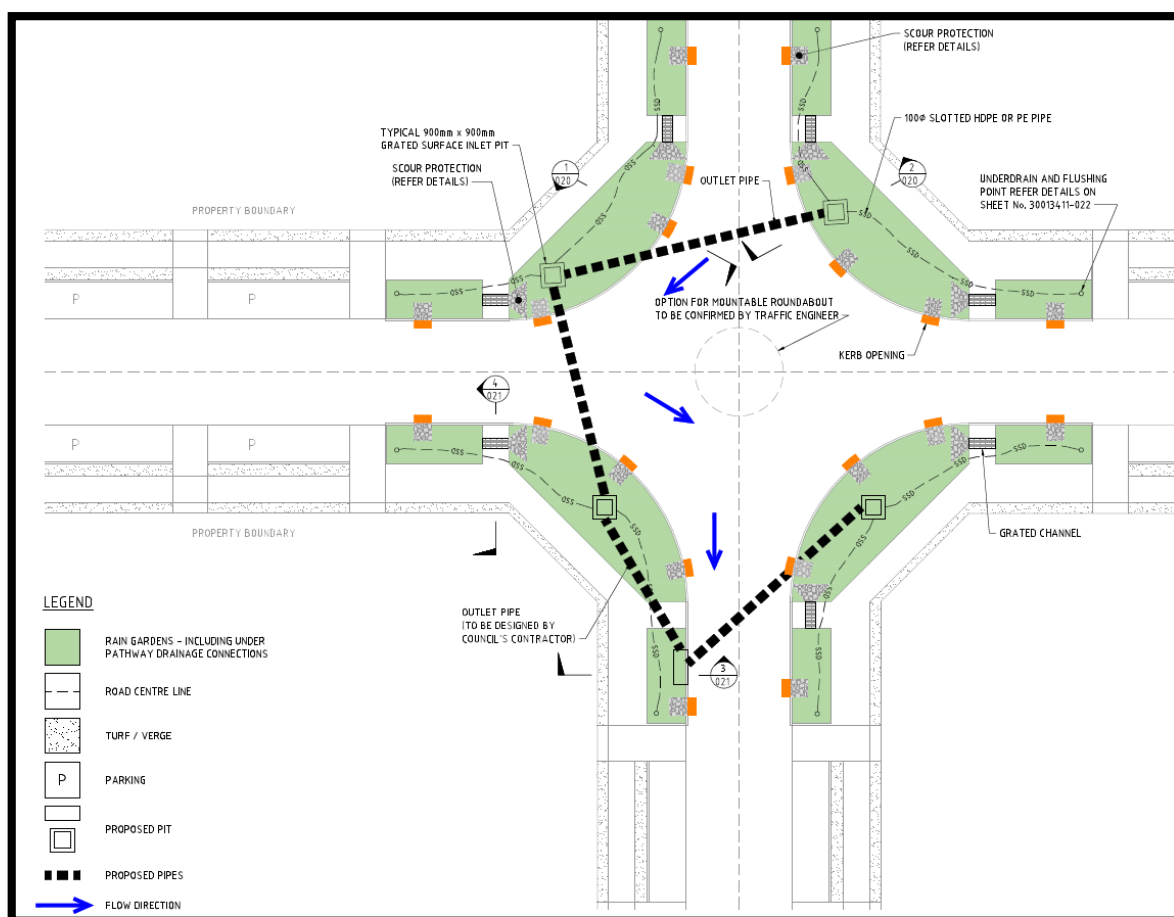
Raingarden General Arrangement at Intersection (SMEC 2021)
